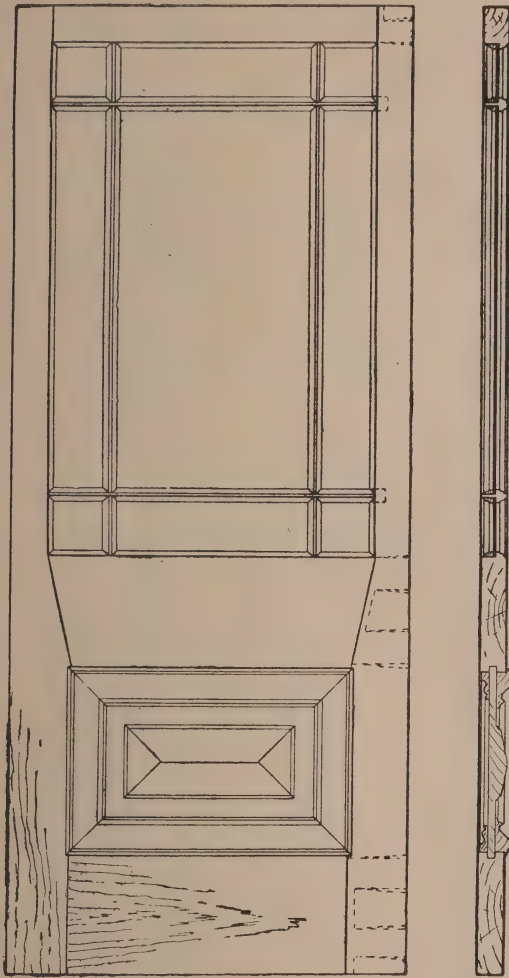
Front Elevation and Vertical and Horizontal Sections of Door with Diminished Stiles
